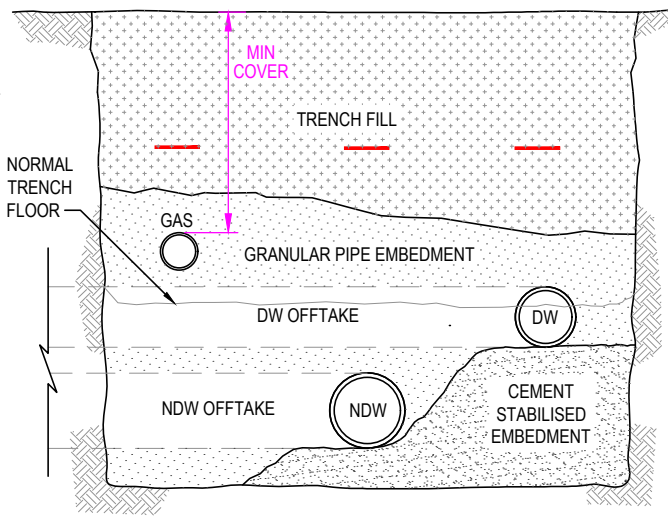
D: SHARED TRENCH WITH COMMON TRENCH FLOOR LEVEL (ADJACENT TO OFFTAKES)
